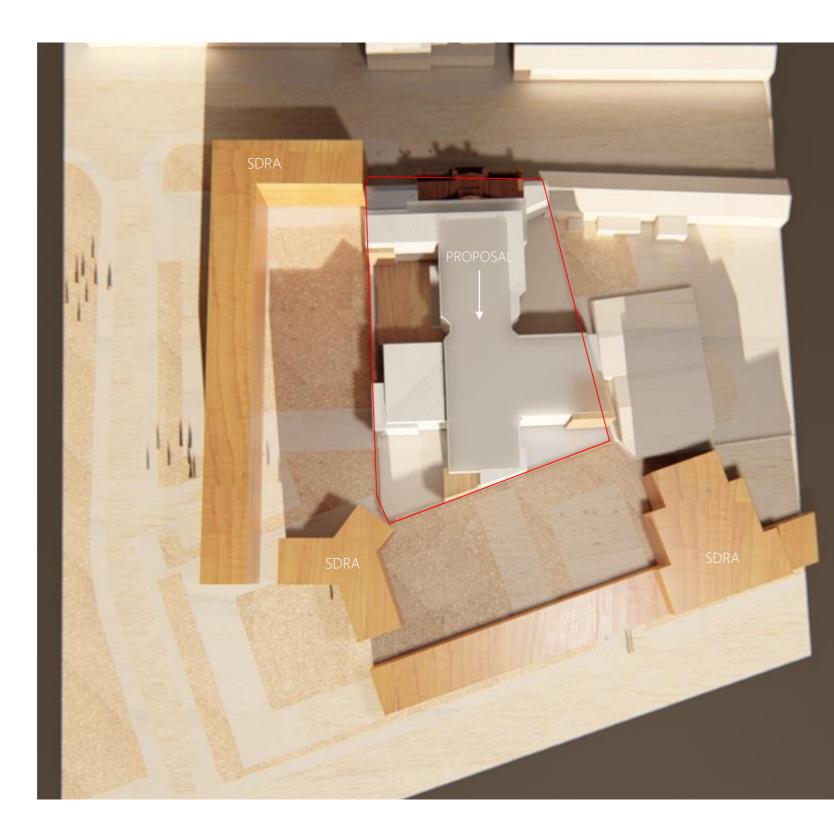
Modelling to show the scale of 5 storey elements of DCC new build to Dolphin Park Road & South circular road . Analysis used DCC recommended heights of 3 meter floor to floor per storey with a 1 meter parapet . These views are also proved out in V.I.A. fig. 20. Modelling to showing DCC layout at time of application establishing semi-private courtyard to the South and West .
